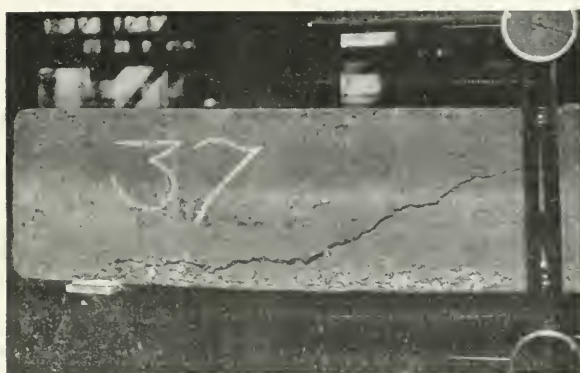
VIEWS SHOWING BEAMS AFTER FAILURE.
